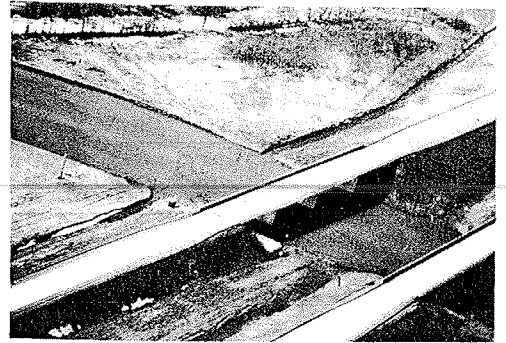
Aerial view of I-80 bridge over Bald Eagle Creek in Centre County. Upper deck is instrumented; instrument shack is on near creek bank just above bridge.
